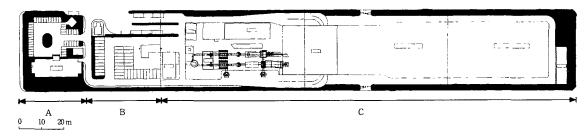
A ground plan showing the planting zone (black part) and facilities. A: office building and parking lot, B: parking lot, C: incinerating facilities.
